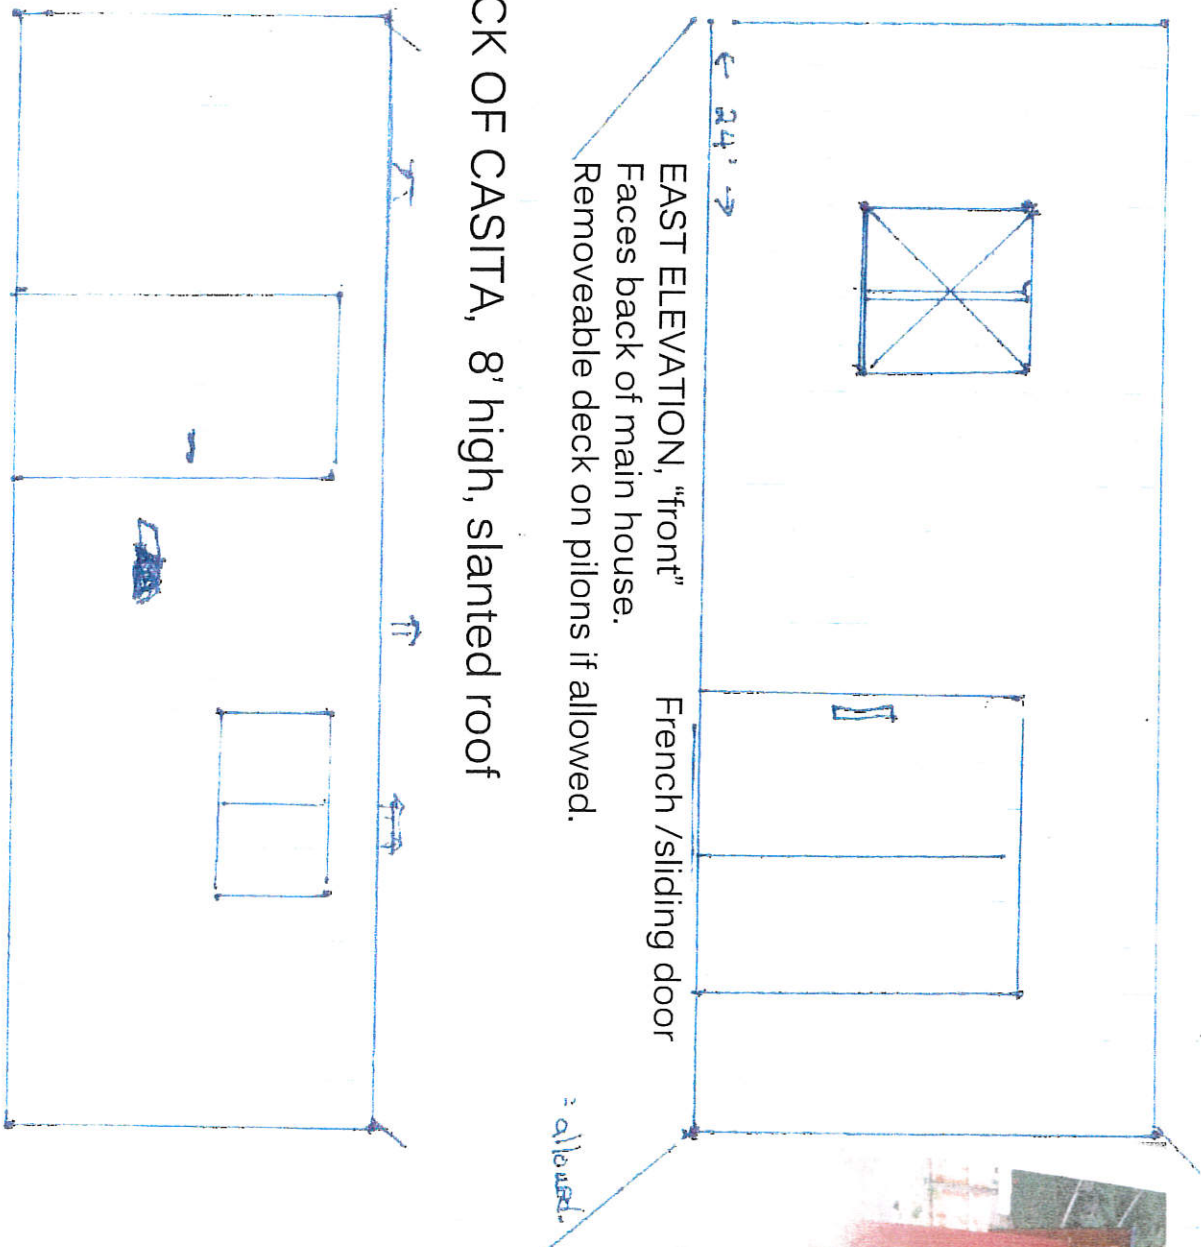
APPLICATION, SITE PLAN, ELEVATION
